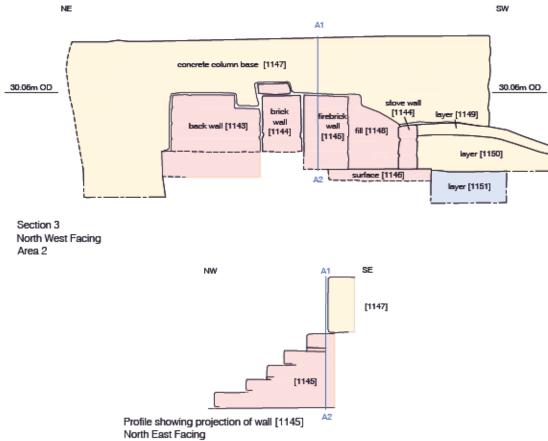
Elevation and Sections of foundry outer wall [1141] 1:20 at A4
